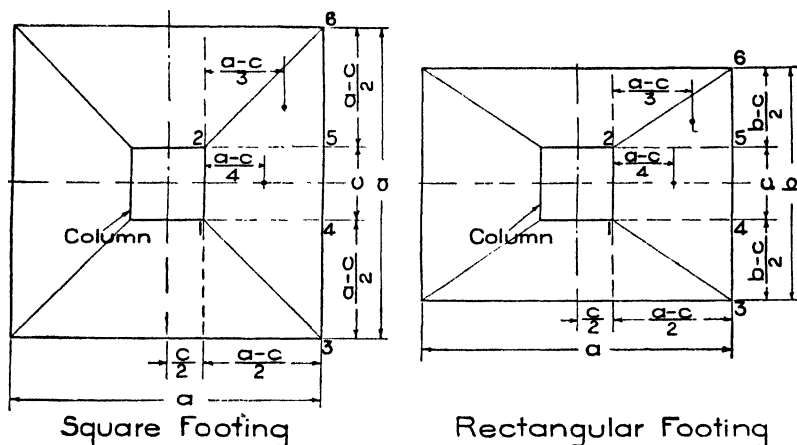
Square and Rectangular Column Footings. (See p. 673.)
